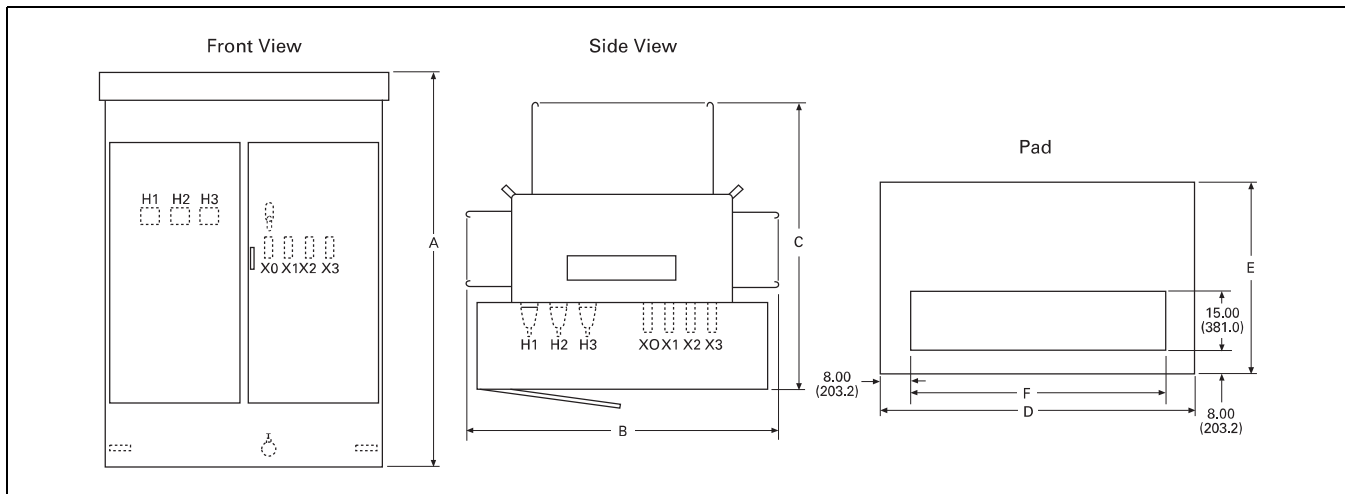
Pad-Mounted Transformer (3000–5000 kVA)—Dimensions in Inches (mm)
